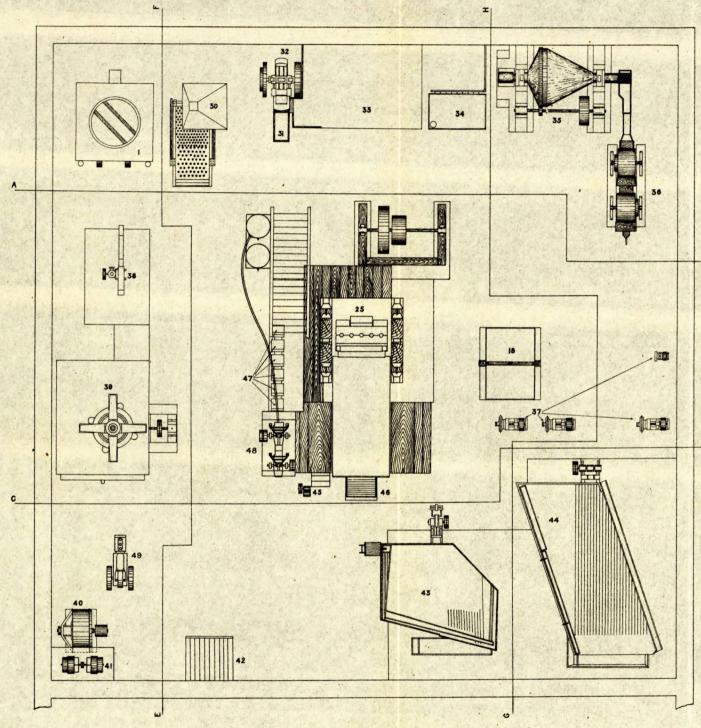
, Plan of Ground Floor, Ore Dressing and Metallurgical Laboratory, Booth Street and Plymouth Avenue, Ottawa.
